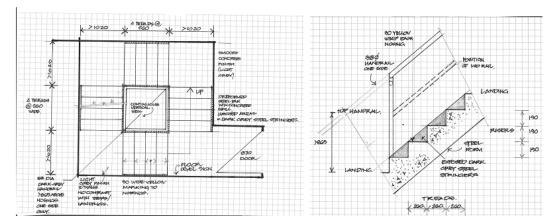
Stair 2 and Typical Section Stairs 1-3 for Building M6
